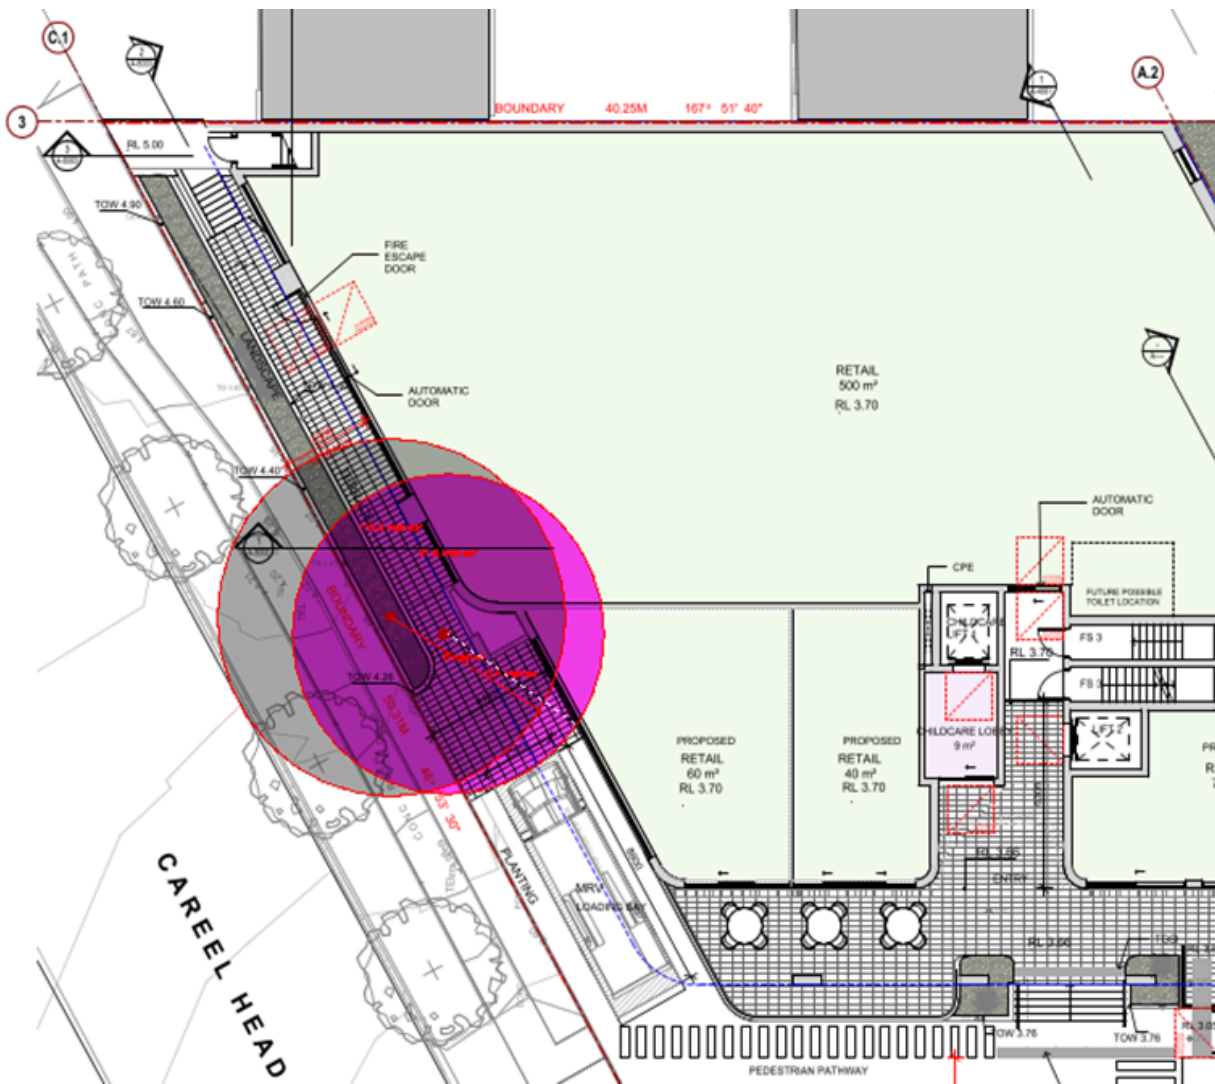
Trees 1 and 2 TPZ overlaid to the proposed ground floor level
